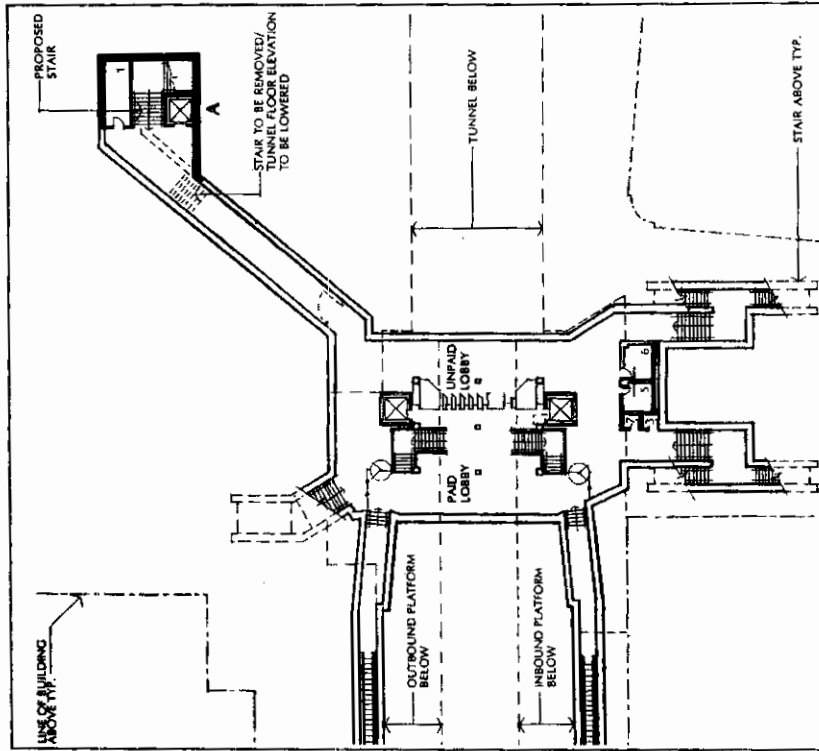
Elevator Option A, mezzanine level Scale: 1"=32'
